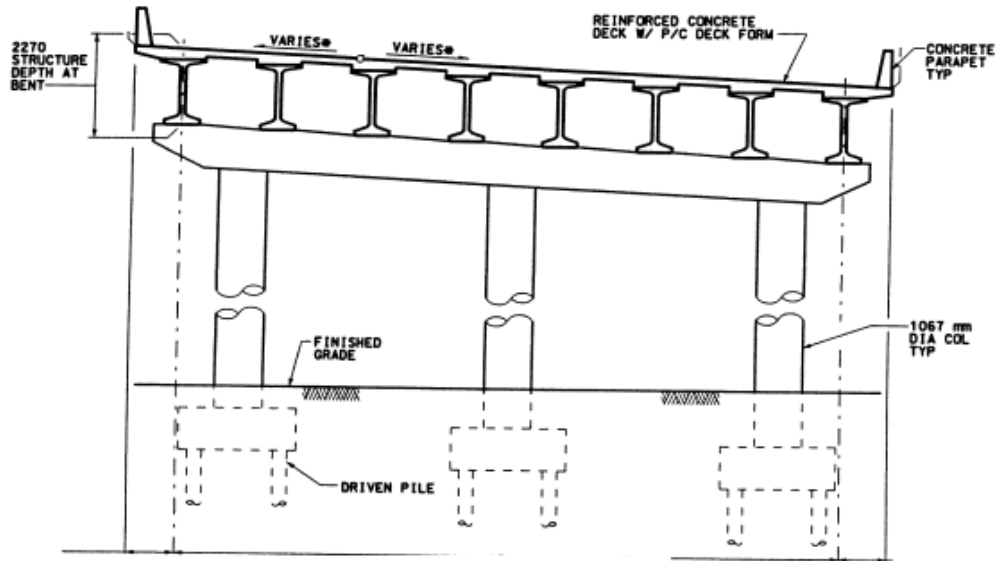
Cross-Sectional View of the 400 South Street Bridge at the Bent (Dimensions in millimeters)
